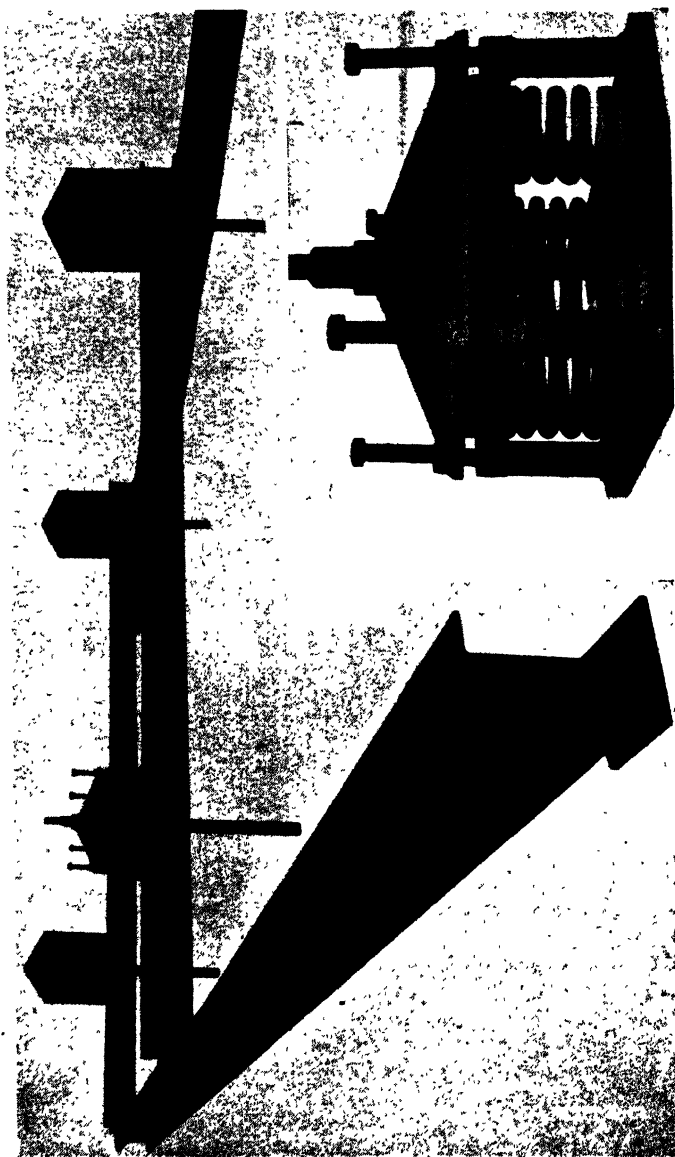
DETAIL OF SPRING MOUNTINGS SUPPORTING ROOM IN FIG. 140
